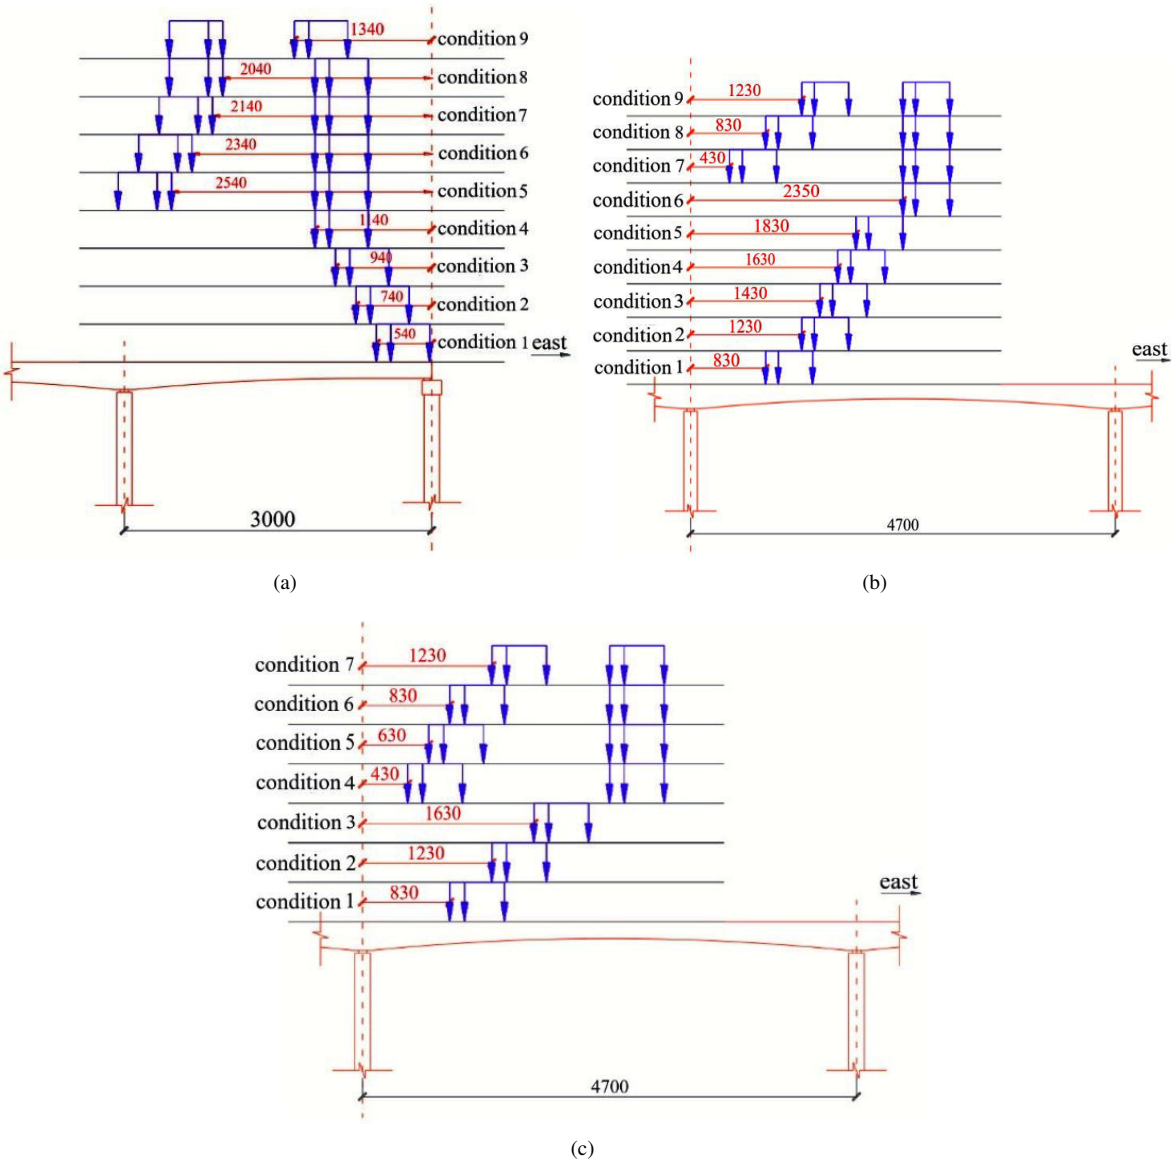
Longitudinal loading position diagrams (a) Section 2-2 (b) Section 1-1 (c) Section 3-3 (Unit: cm)
